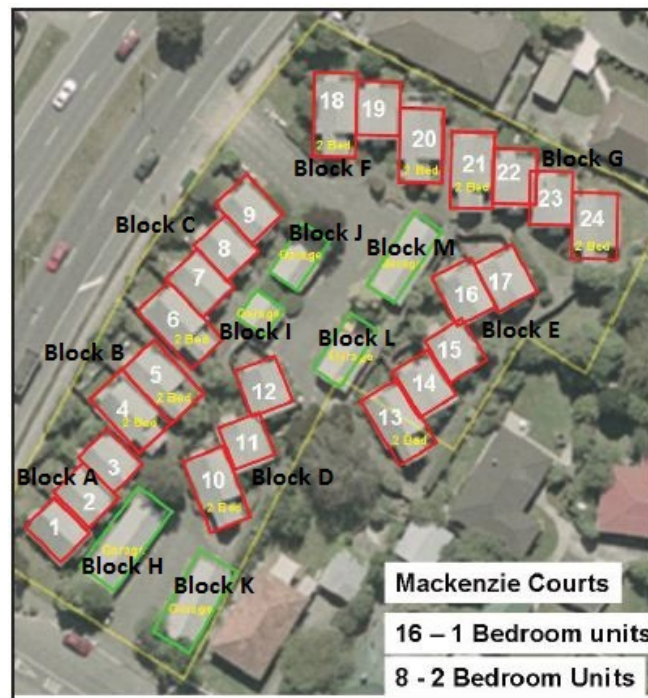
Site plan of MacKenzie Avenue Housing Complex.
